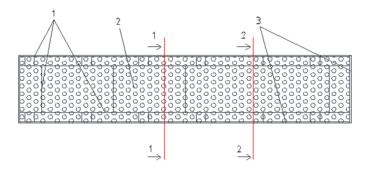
Transverse (horizontal) section of the new wall-enclosing structure: 1 – a frame made of fibre-reinforced plastic; 2 – expanded polystyrene concrete 240 mm; 3 – non-removable formwork made of 10 mm chipboard
